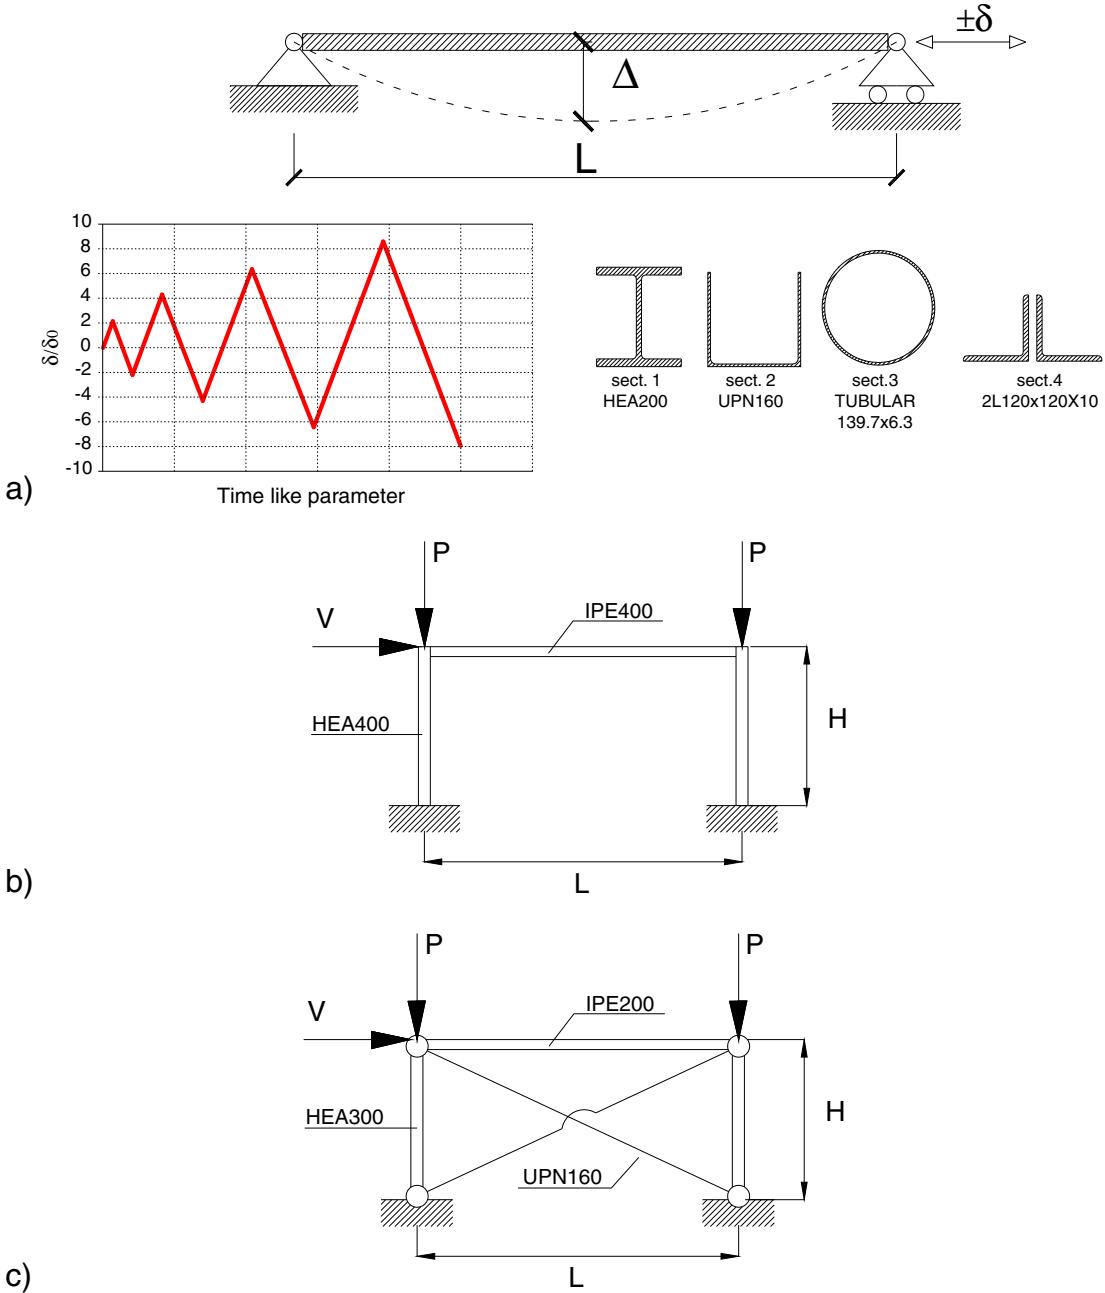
a) Simple brace under tension/compression cycles, b) one storey-one bay portal frame, c) simple braced frame.
